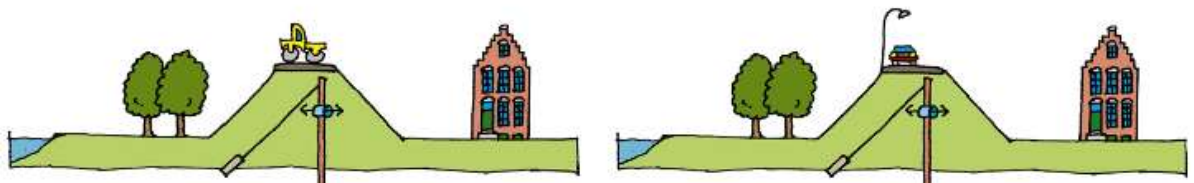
Schematic cross section of situation 7: construction of road (left) and final situation (right).
